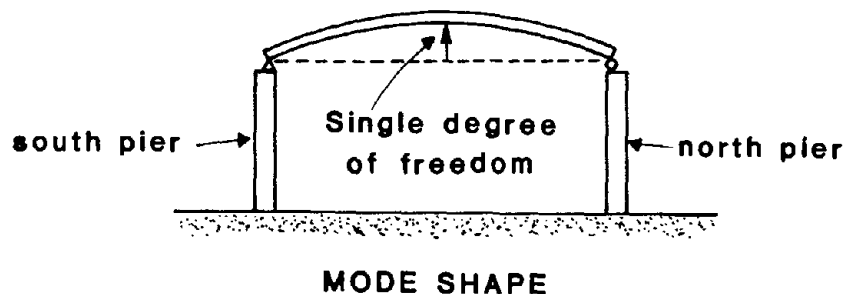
Triple simple span bridge. Vertical flexural mode of vibration of span 2 (assuming distorted shape of span 2 can be approximated as a half sine wave).
